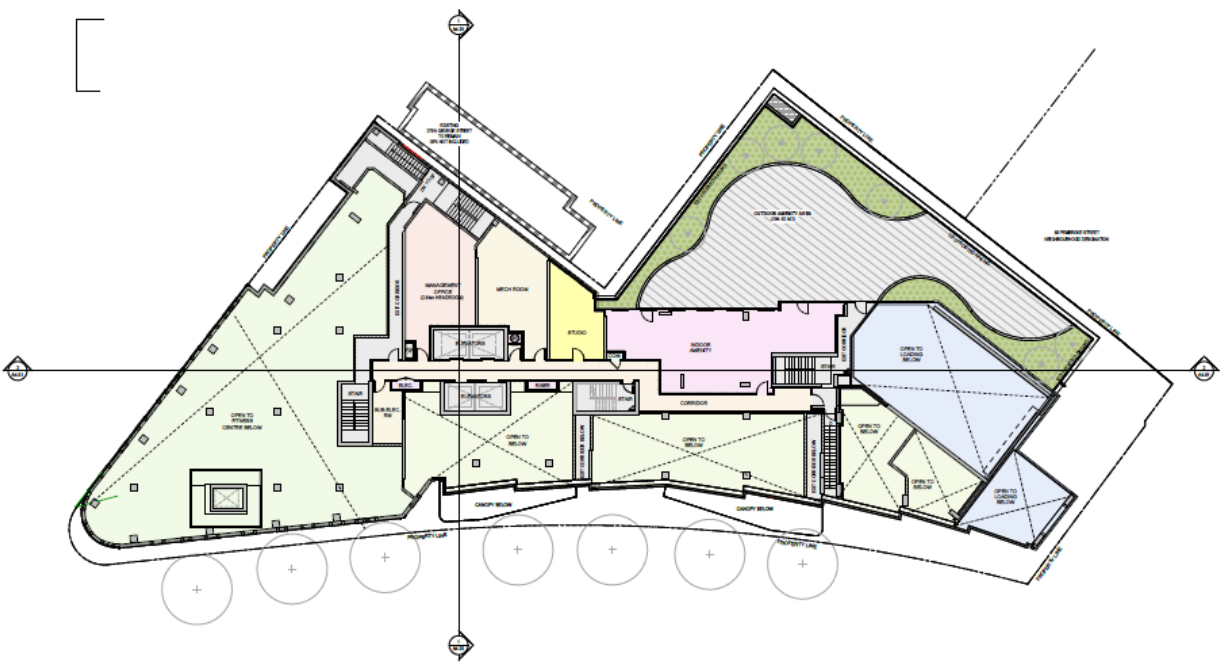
Level 2 floor plan for 212 Dundas Street East included for illustration purposes (Rafael & Bigauskas Architects Inc., February 23, 2026).
